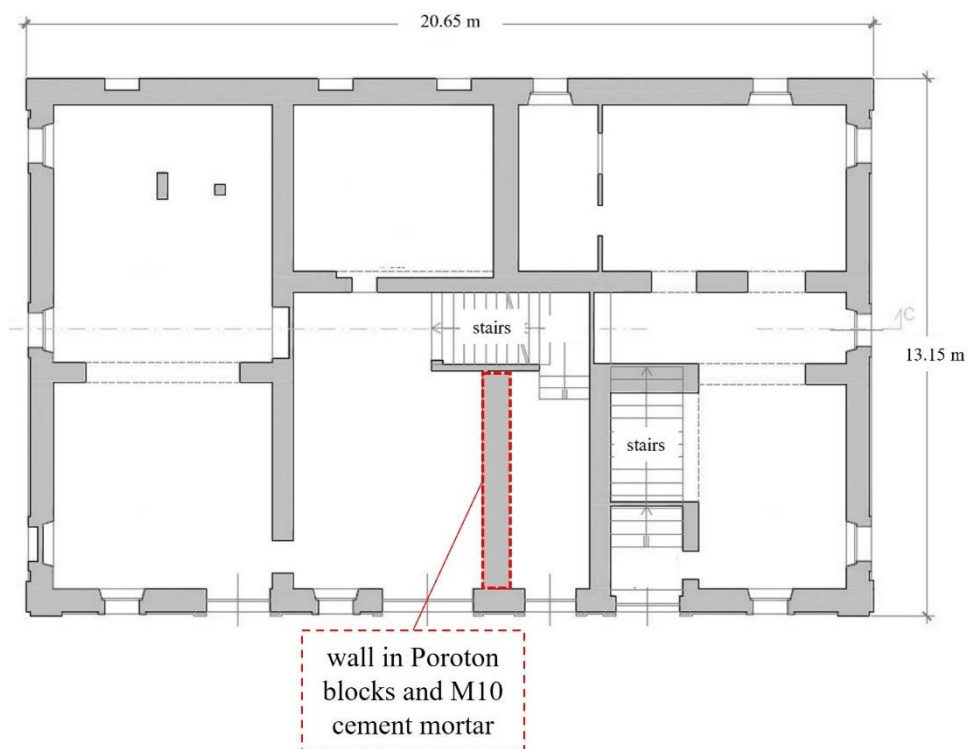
The new wall made in Poroton blocks and M10 cement mortar.
